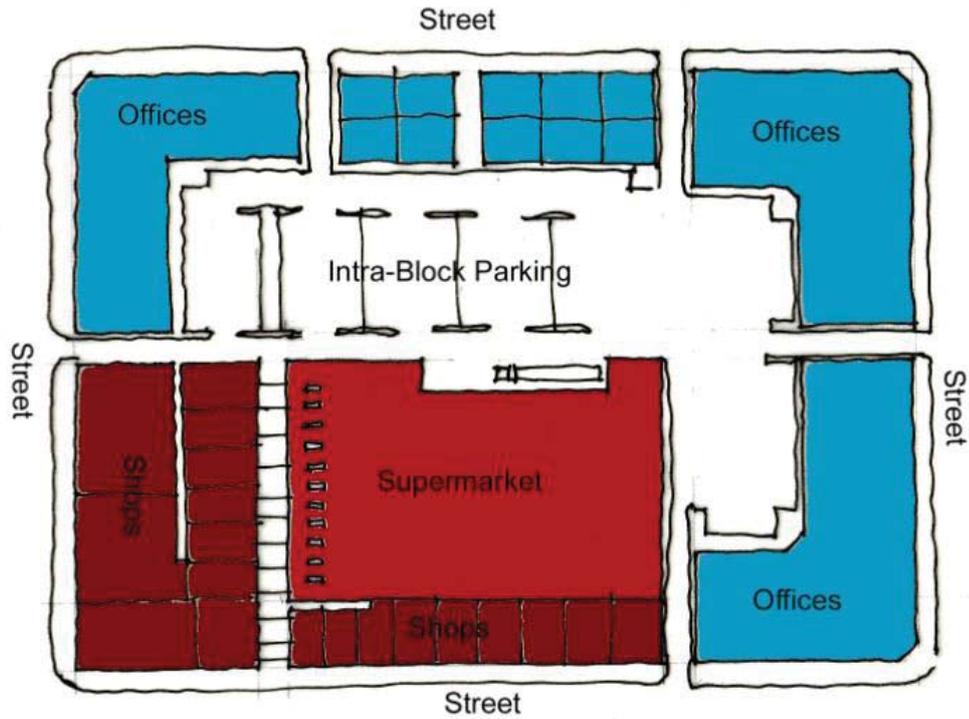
Design for a large retail outlet and car park ‘sleeved’ to maximize active street frontages for surrounding streets
